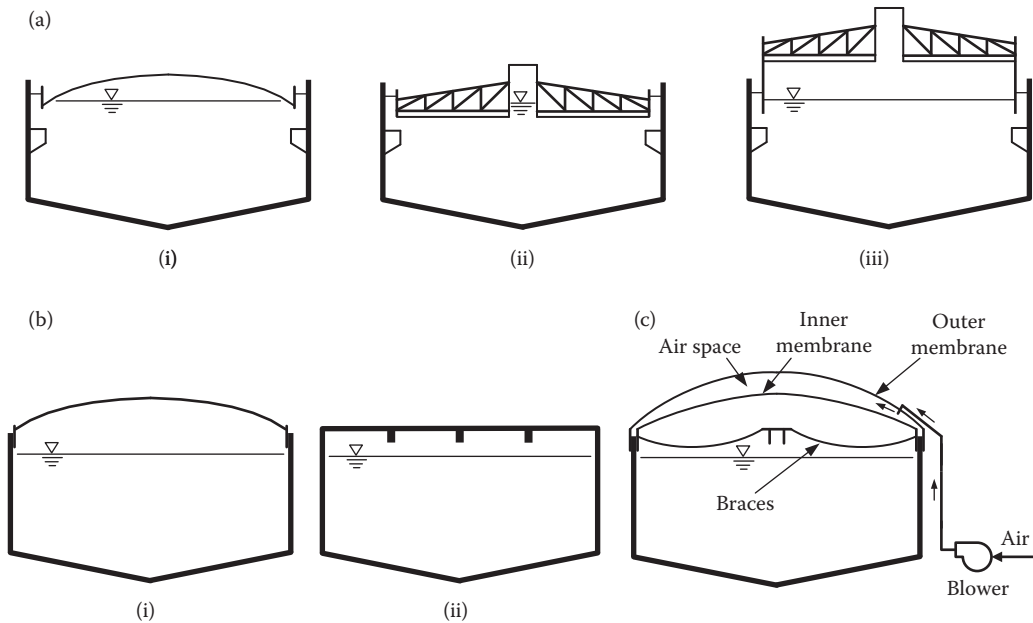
Sample digester covers: (a) floating types: (i) Wiggins, (ii) Downes, and (iii) gas holder; (b) fixed types: (i) domed, and (ii) flat slab; and (c) membrane type.
